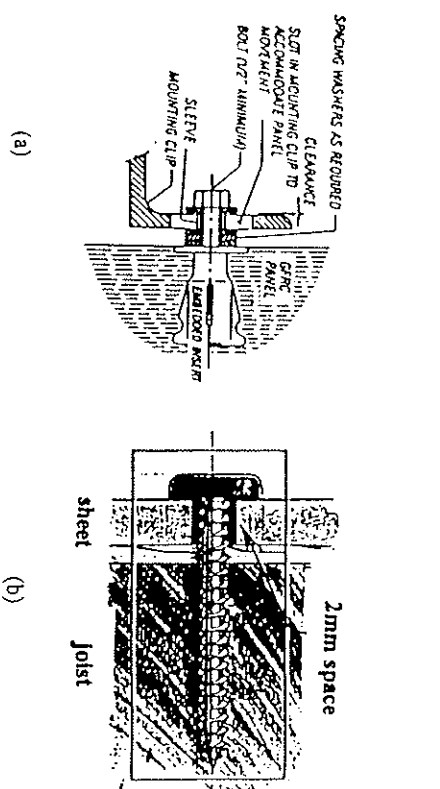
Examples of some connections allowing local flexibility recommended for use in (a) glass fiber reinforced cements; (b) cellulose-reinforced cement.
